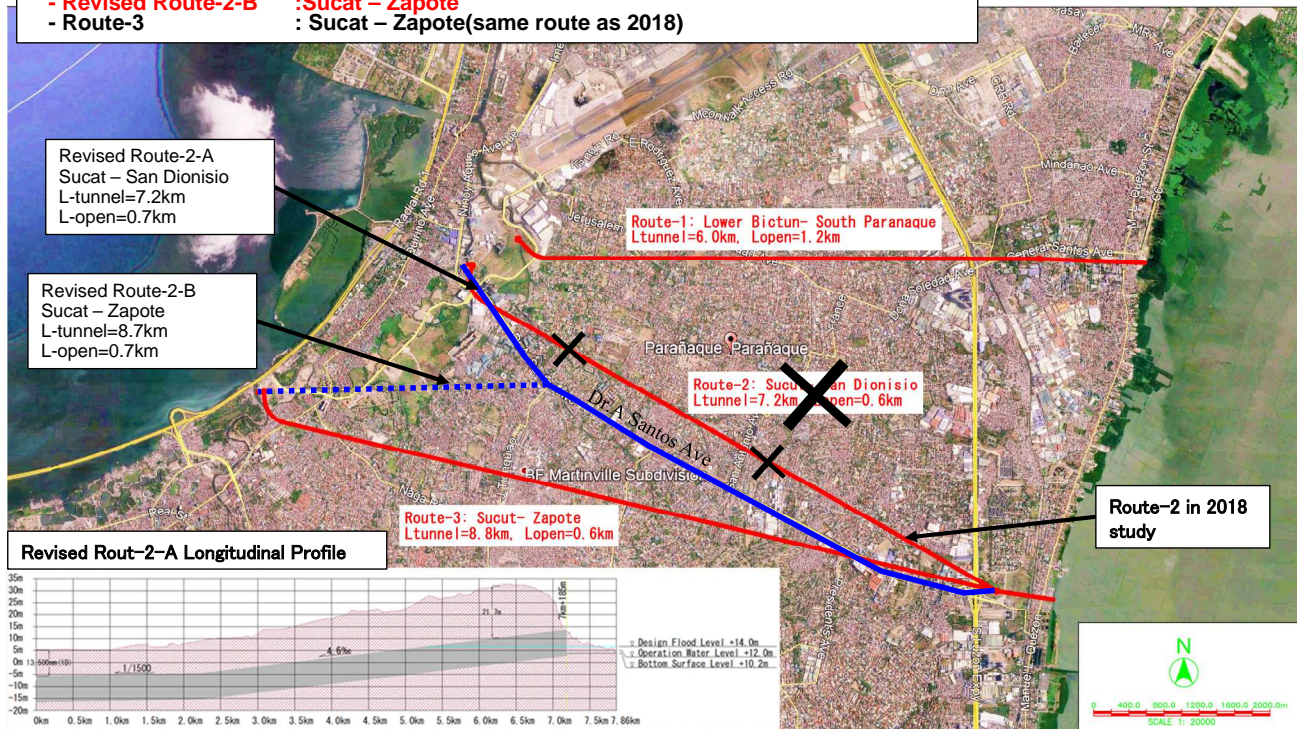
Alignment Plan Drawing of Parañaque Spillway, 2020
